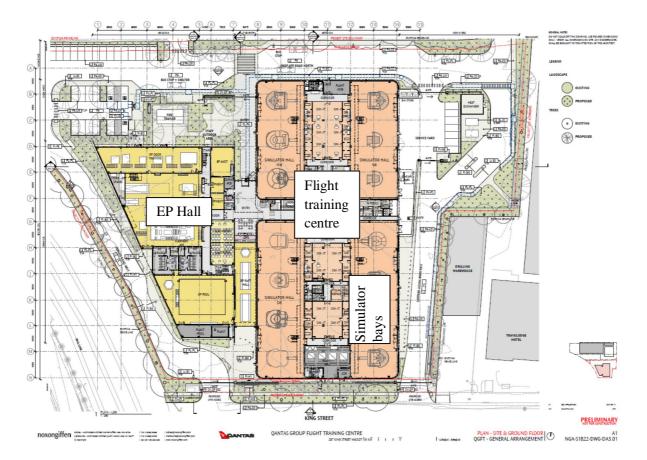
Site & Ground Floor Plan of the QGFTC building
